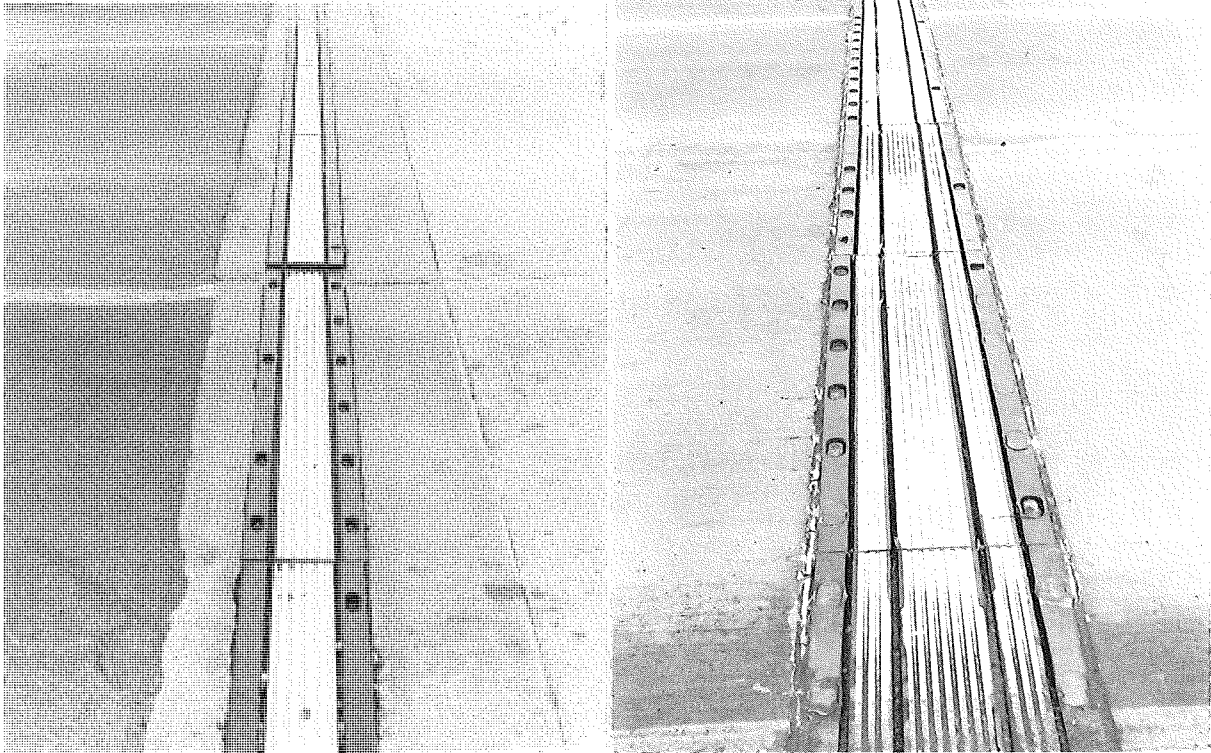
Waboflex installations showing vertical misalignment between pads (left) and missing stud well plugs (right).
